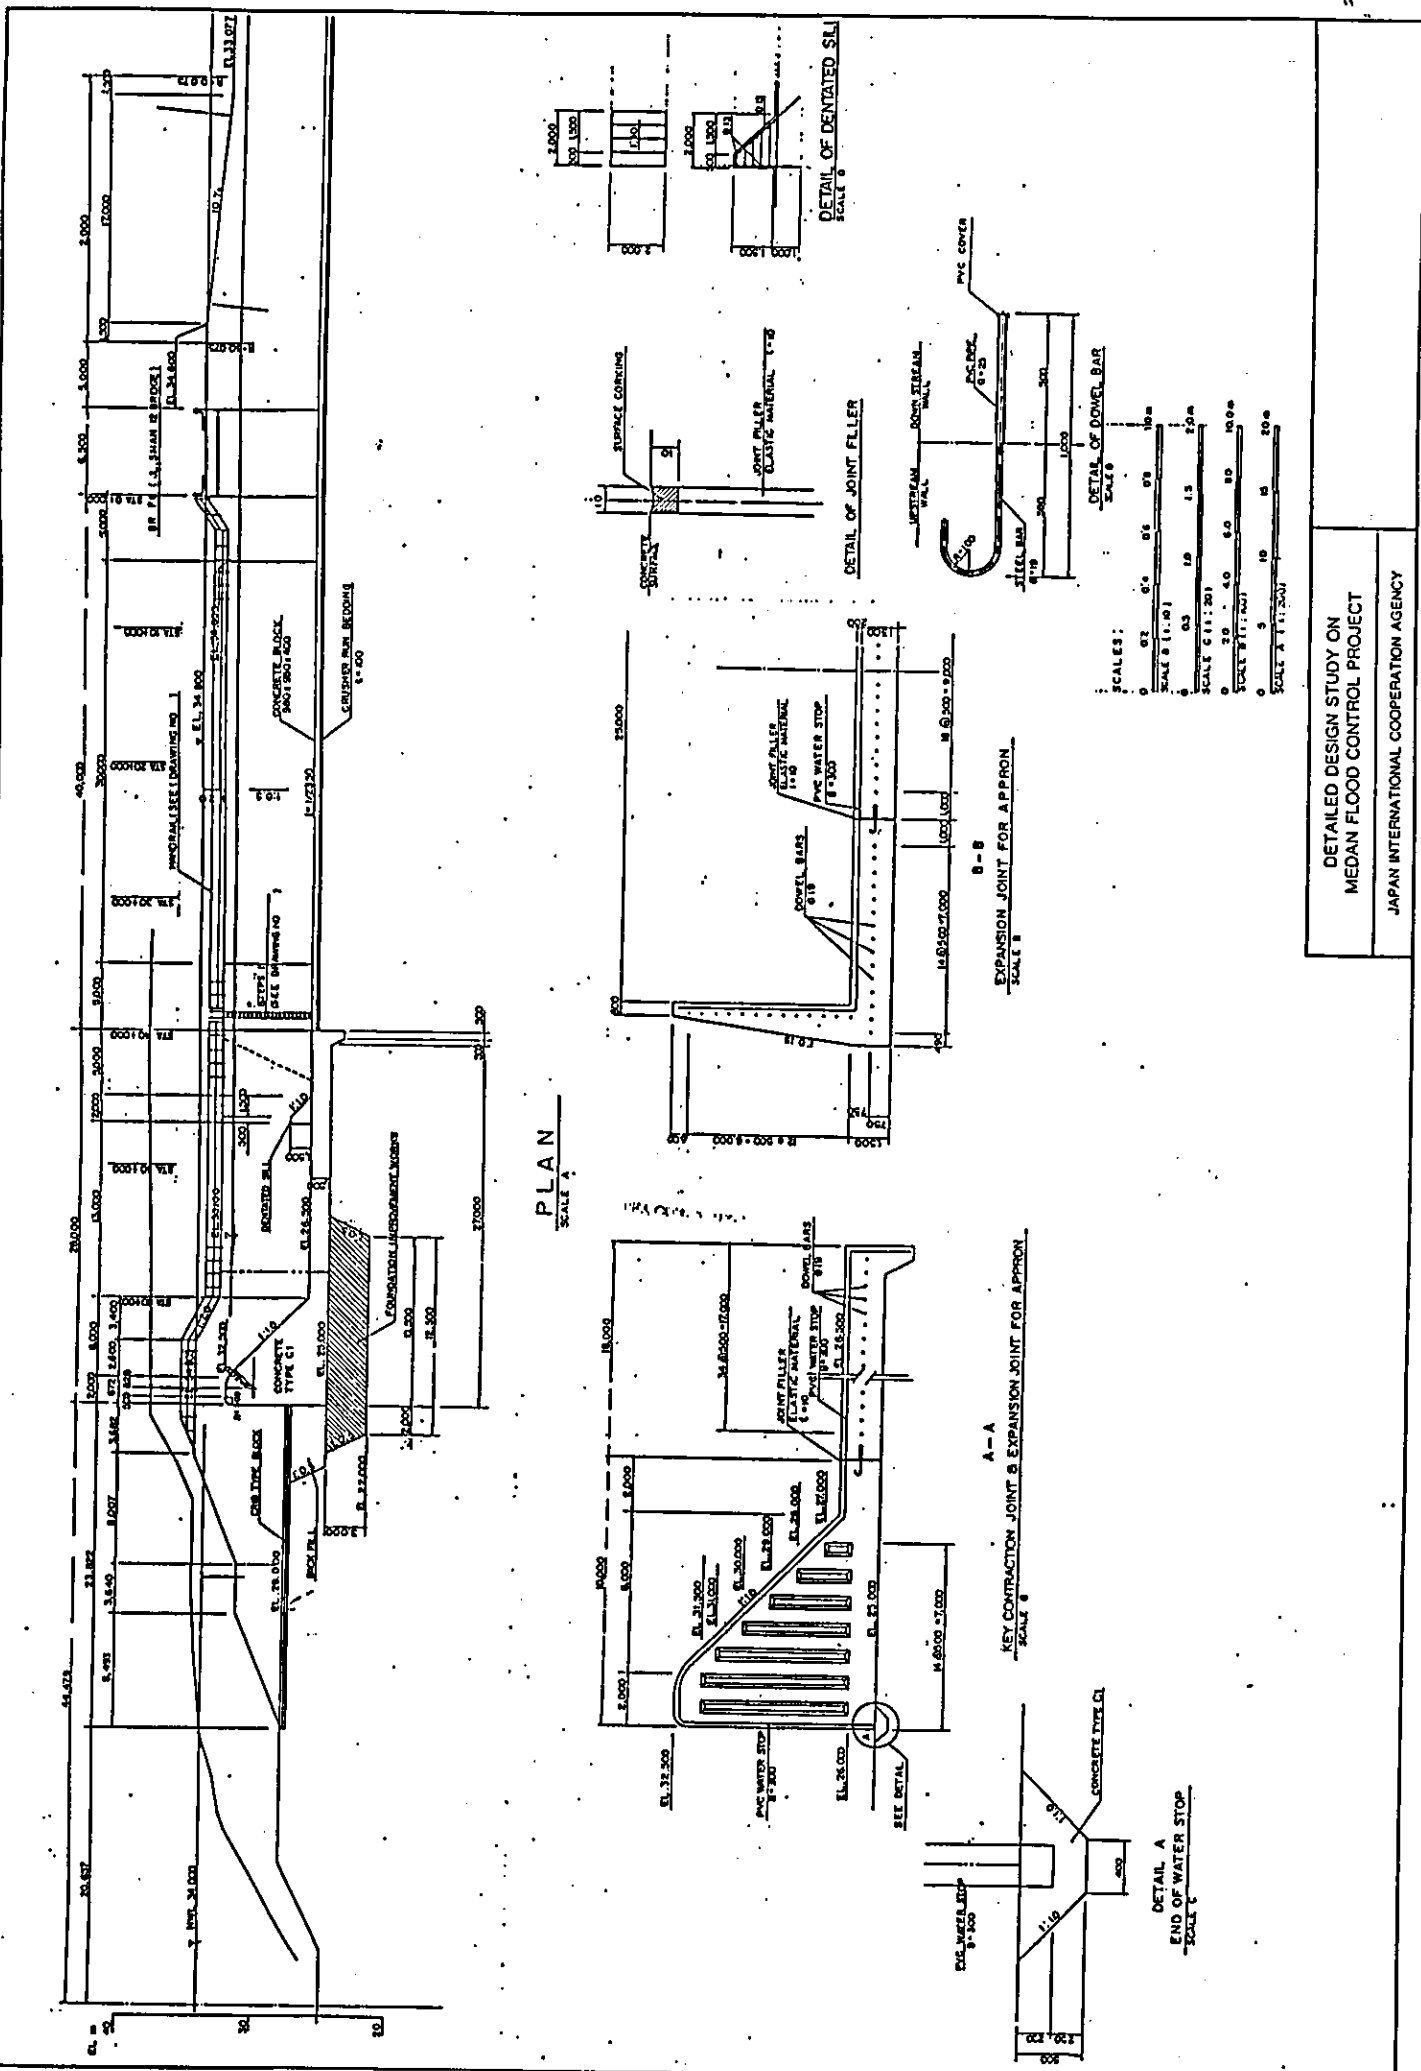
(2/2) FLOODWAY WEIR, LONGITUDINAL PROFILE
